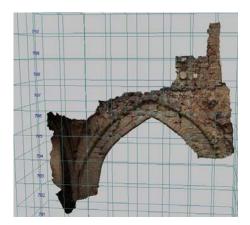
, 70 &71: Point Cloud_1, 2 & 3 of southern wall
